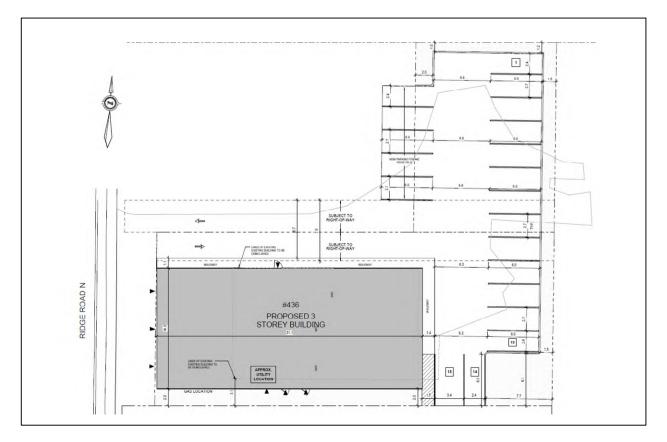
Preliminary Mixed-use Building Site Plan (Jason Pizzicarola Design - Architects Inc.)
